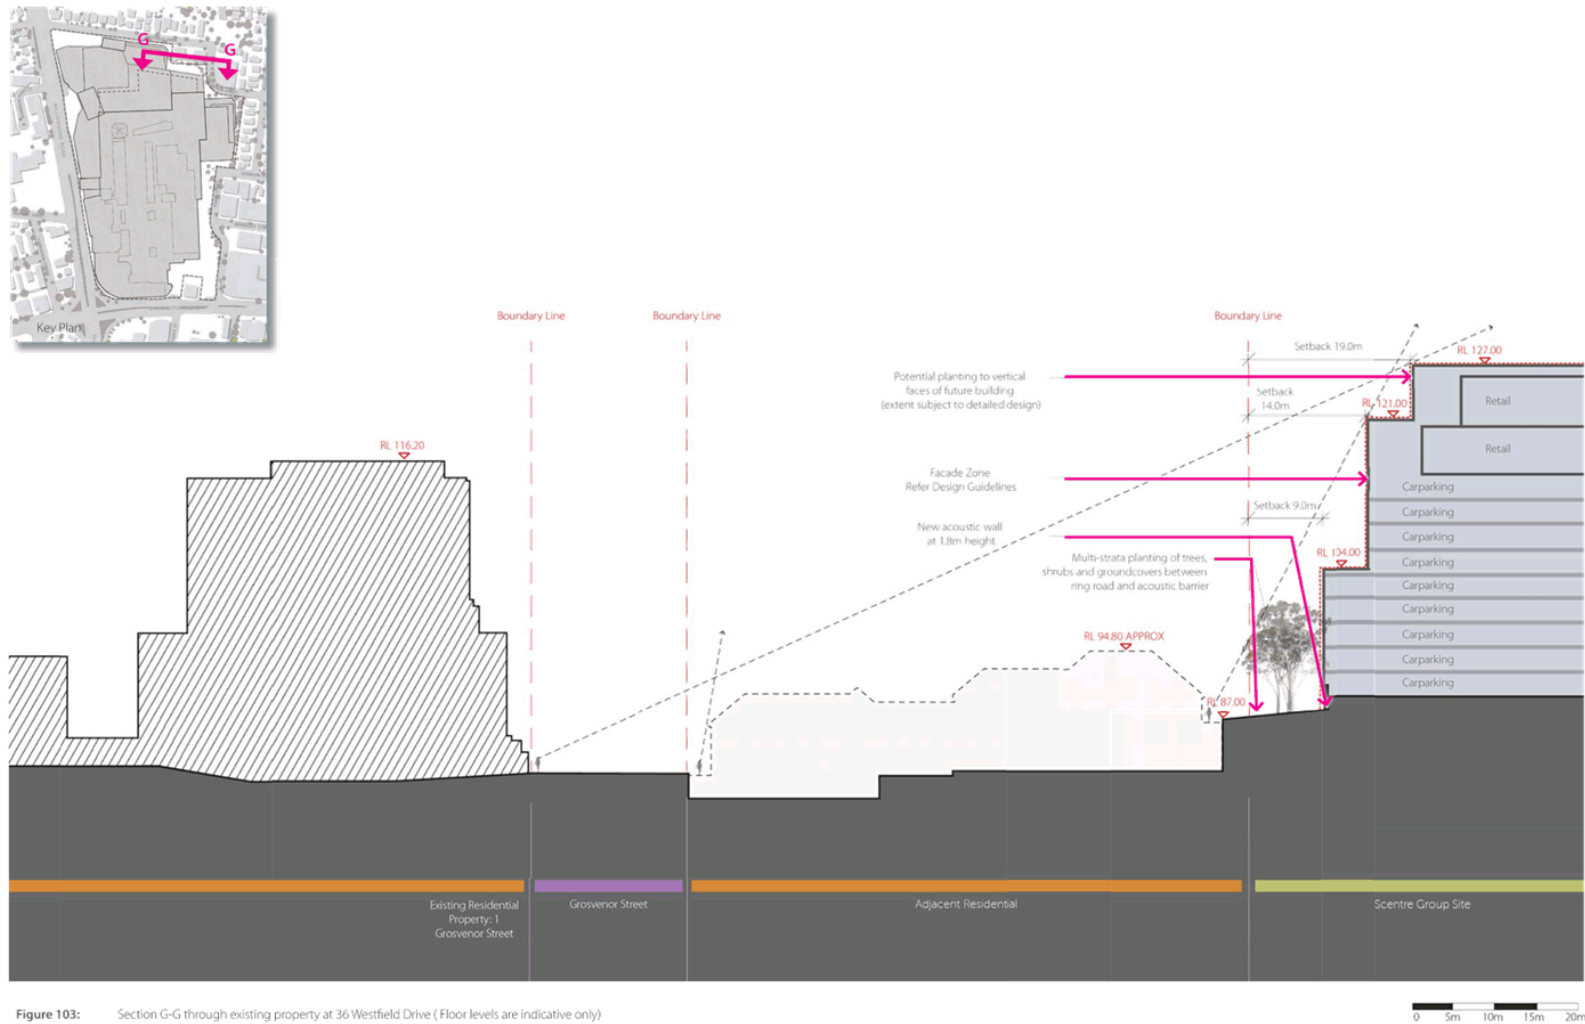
Section G-G through existing property at 36 Westfield Drive (Floor levels are indicative only)
